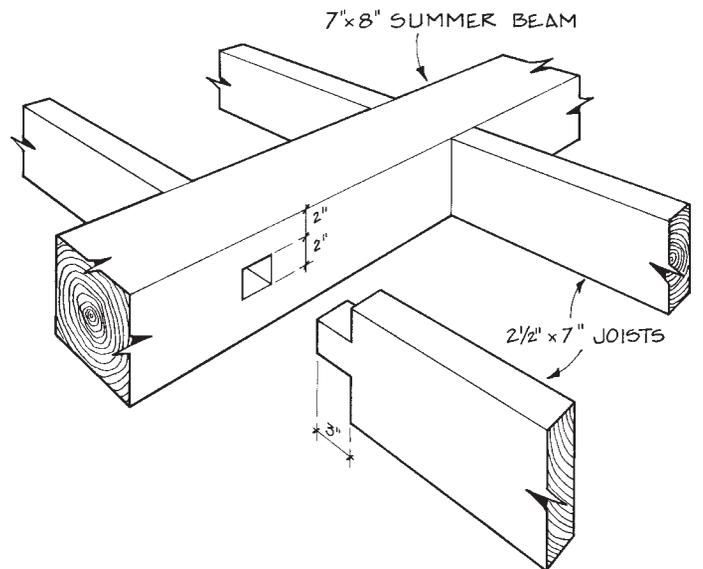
Simple tenoned joists supported the second floor of a 1791 Cape-style house in Cheshire, Massachusetts.
